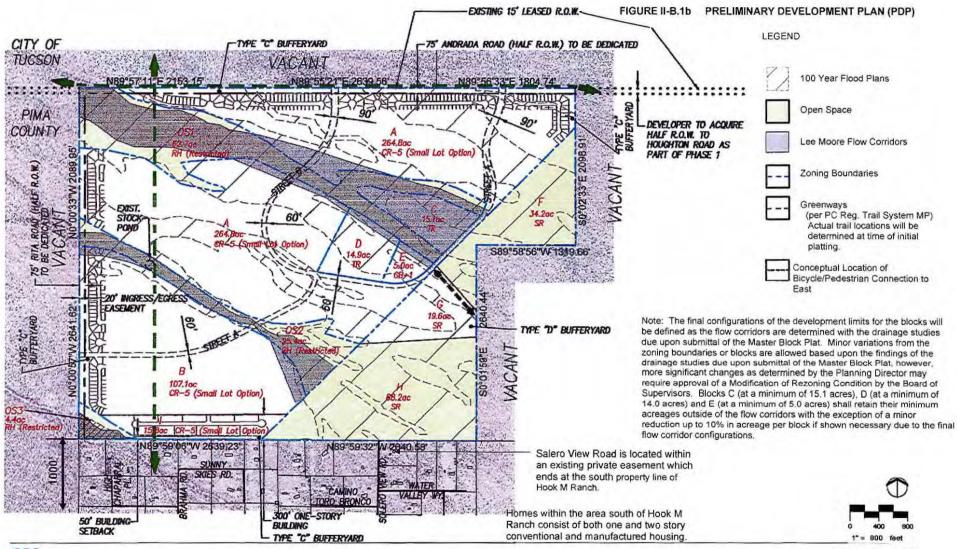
PRELIMINARY DEVELOPMENT PLAN (PDP)
